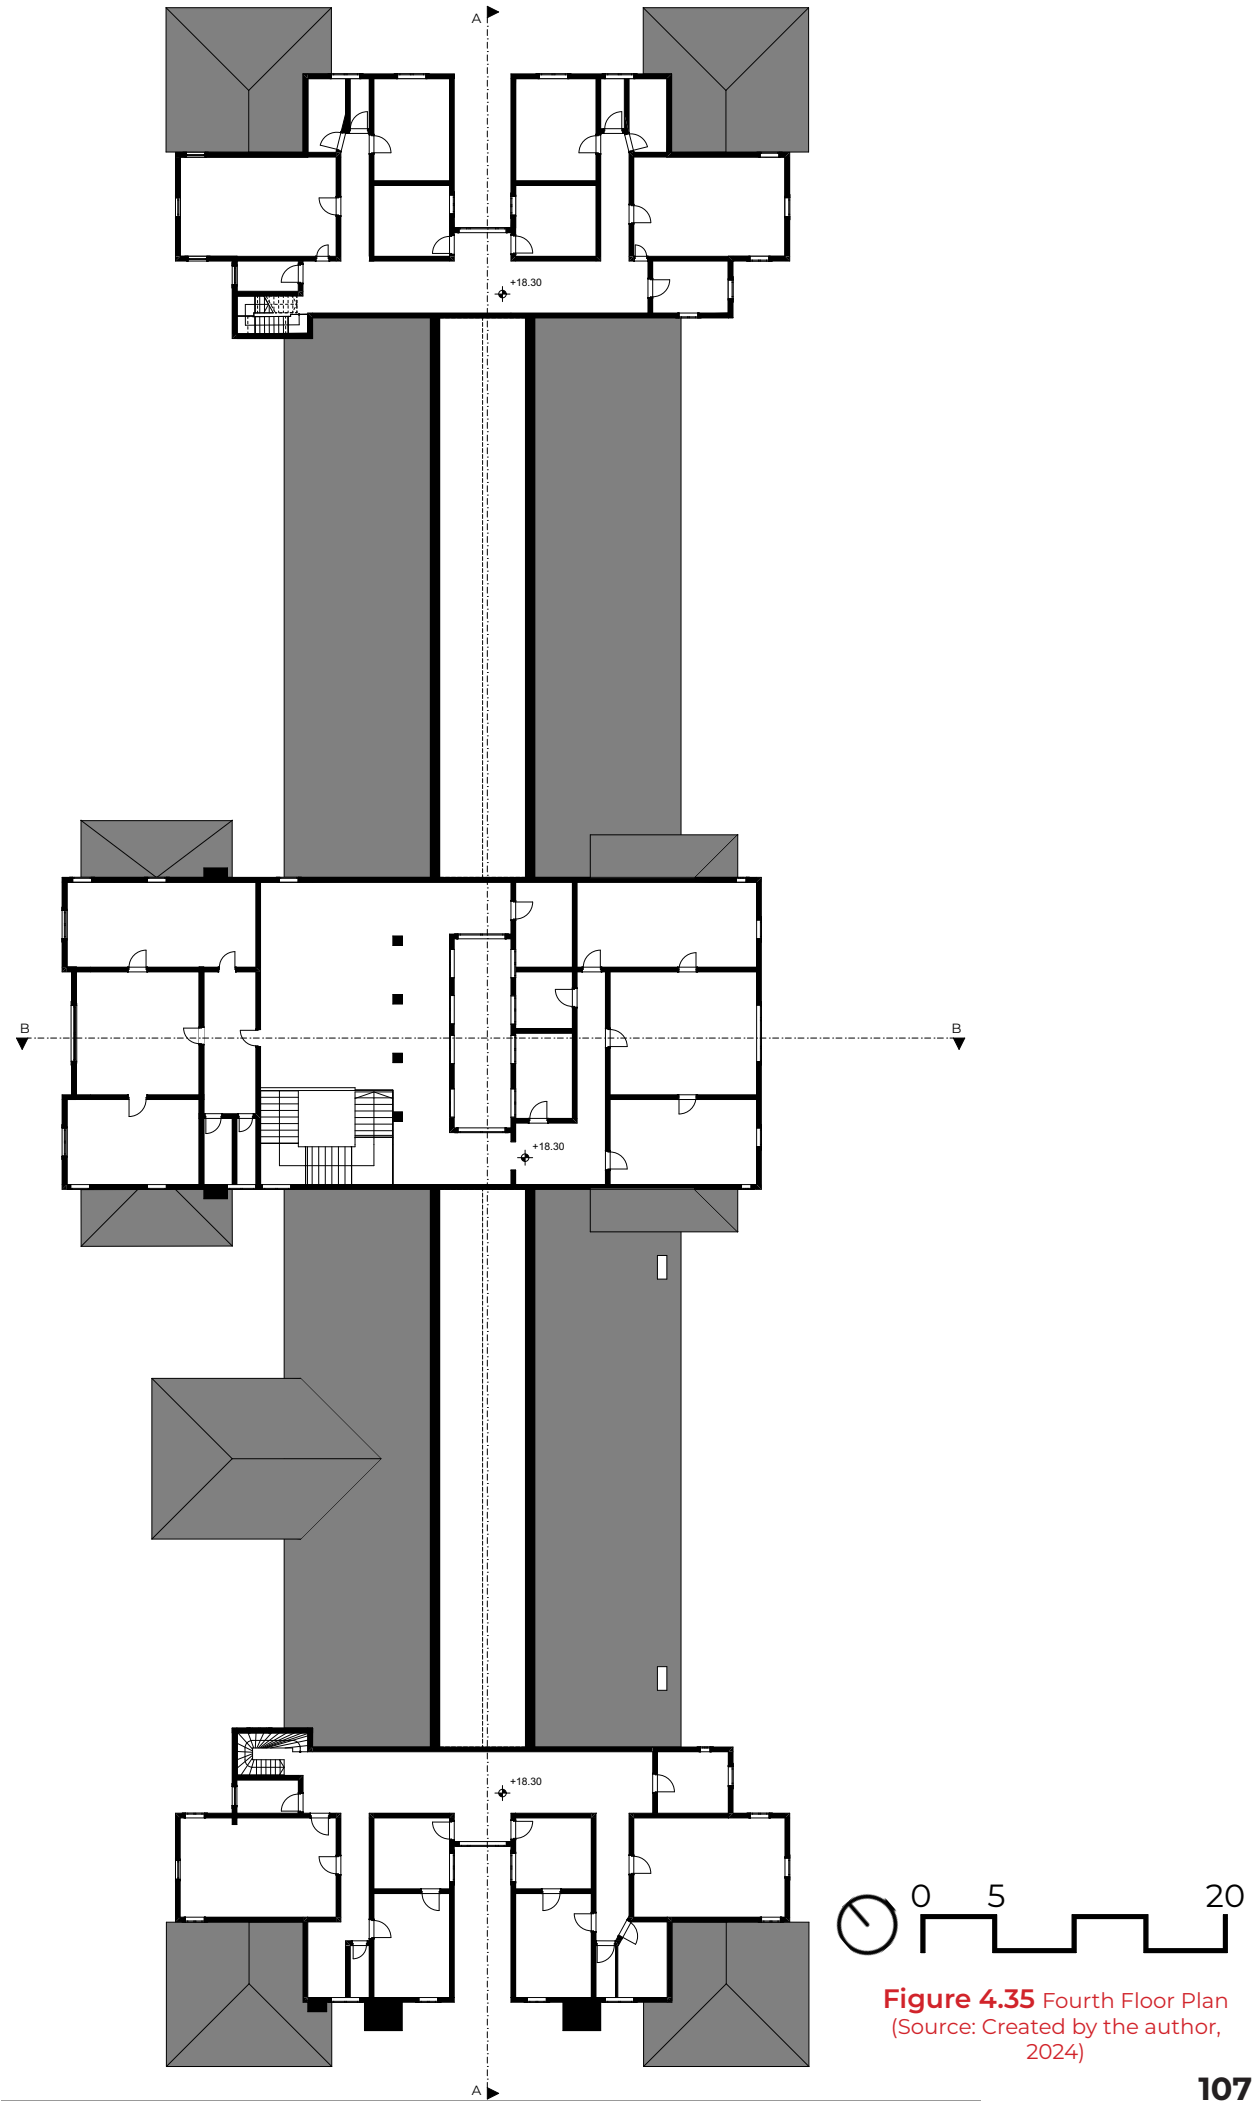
Fourth Floor Plan (Source: Created by the author, 2024)
